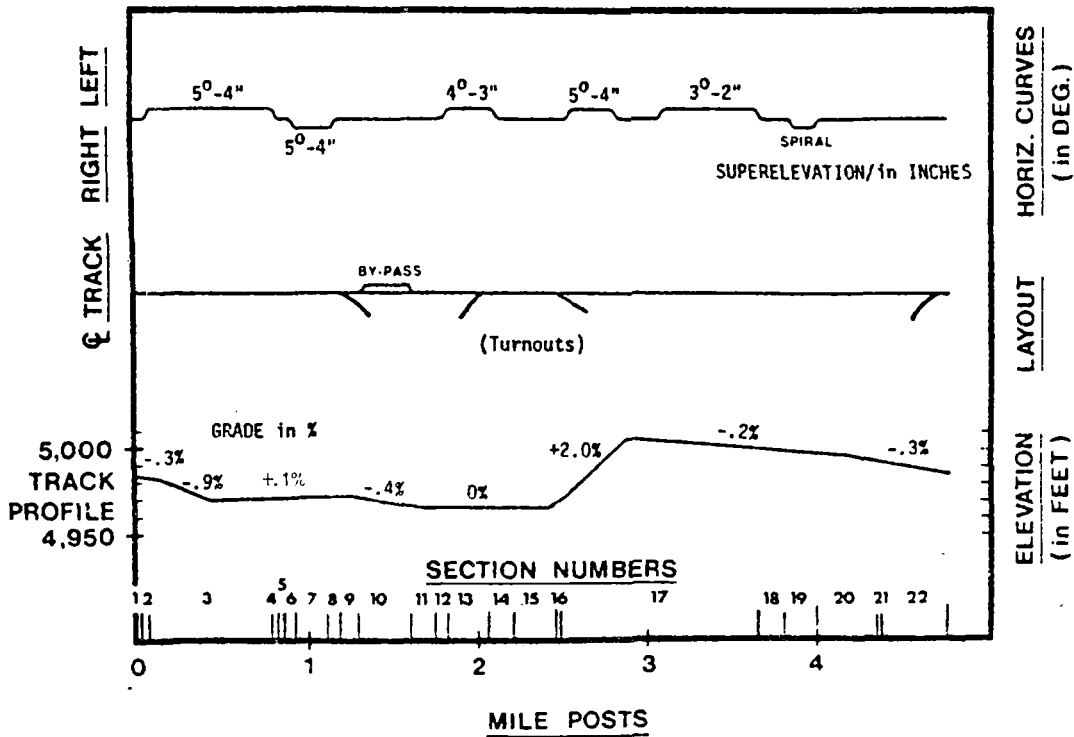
LAYOUT OF THE FAST TRACK.
